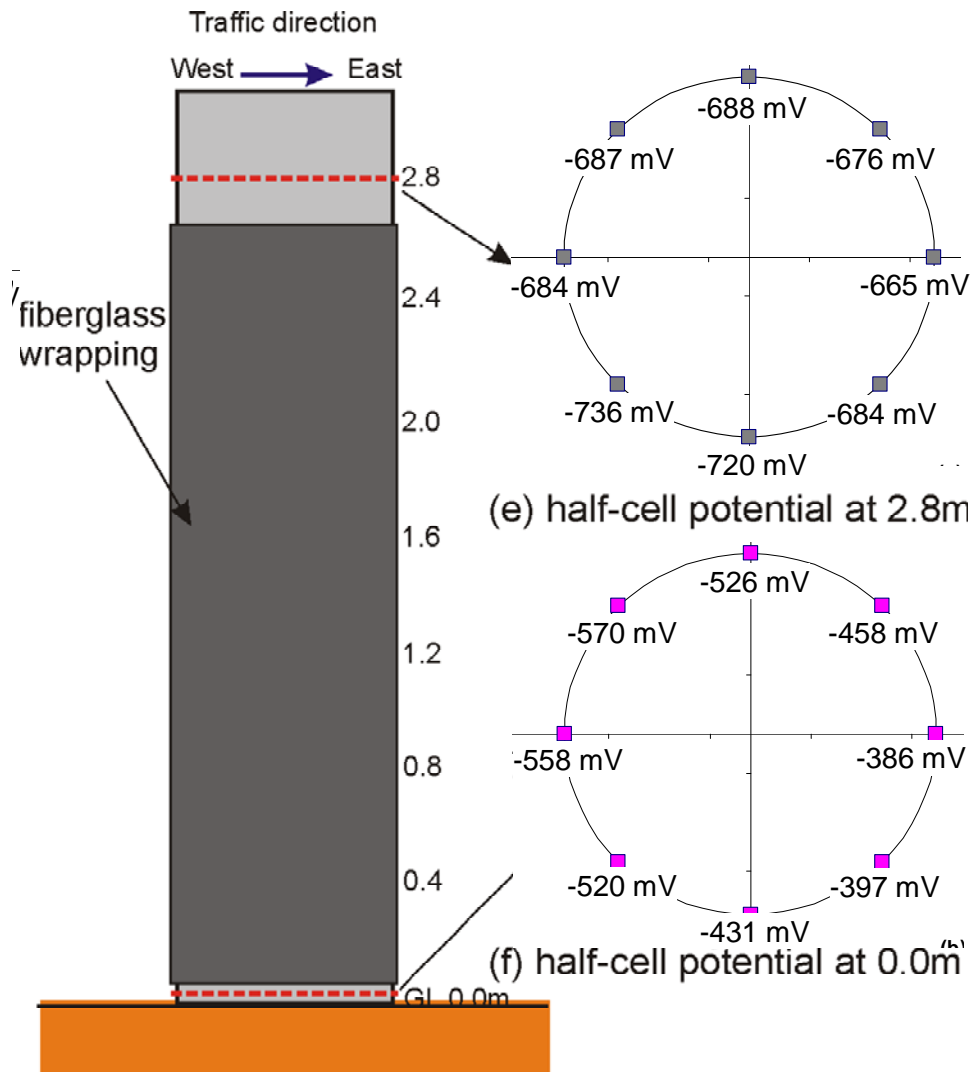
Half cell potential measurement in Bridge B-28-45 column B (summer 2008): (a) above wrap and (b) below wrap.
